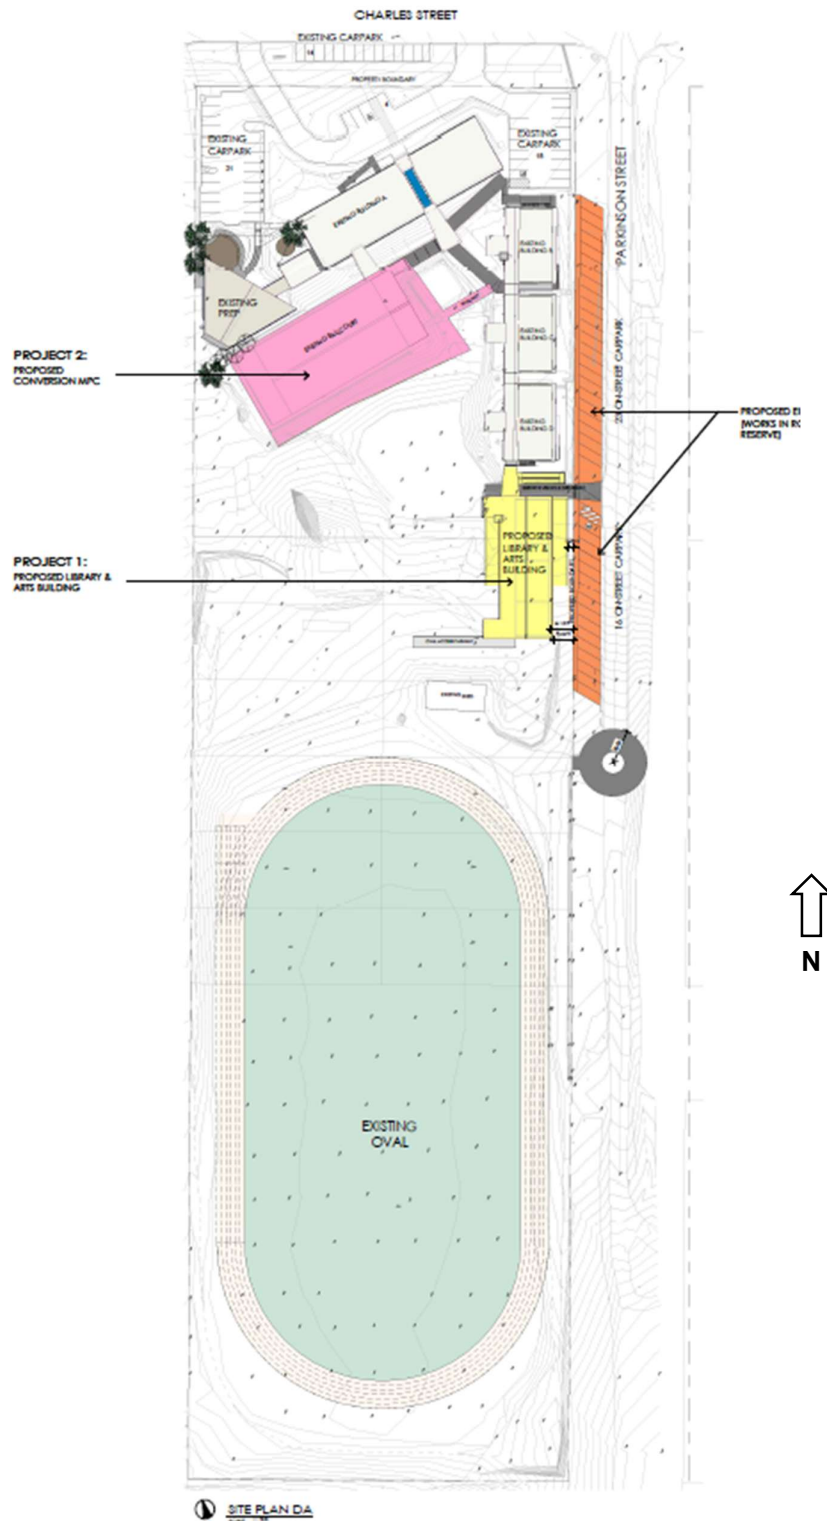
Plan of proposed development with new Library and Arts building (yellow), converted ball court (pink) and additional parking (orange).
